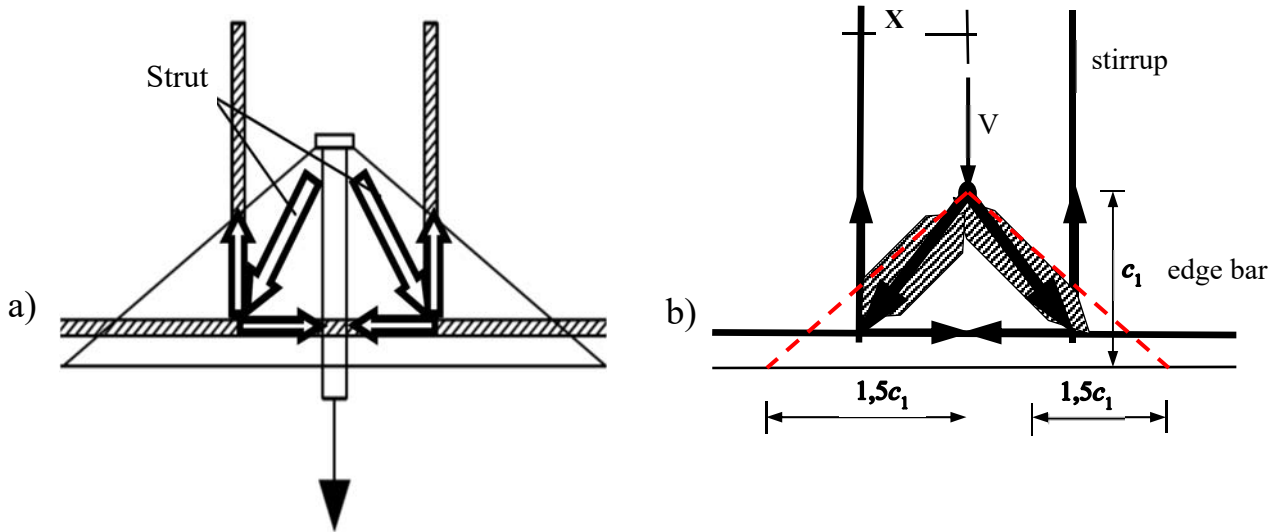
Strut-and-tie models for fastenings with supplementary reinforcement, a) tension loading, b) shear loading, taken from [9]
